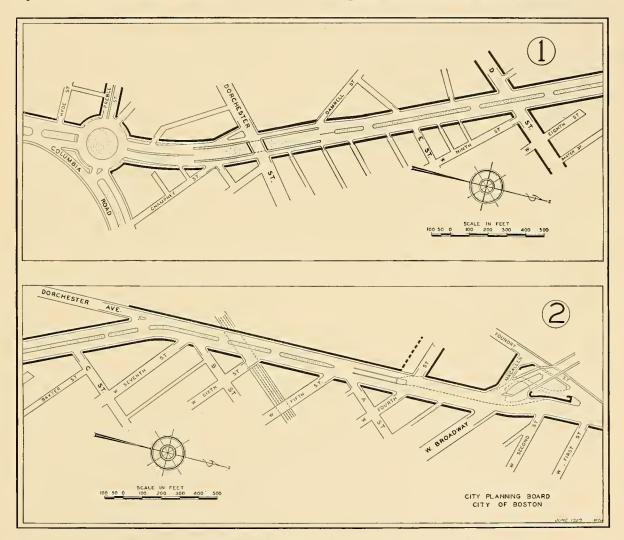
PLAN OF DORCHESTER AVENUE AND OLD COLONY AVENUE WIDENING.
